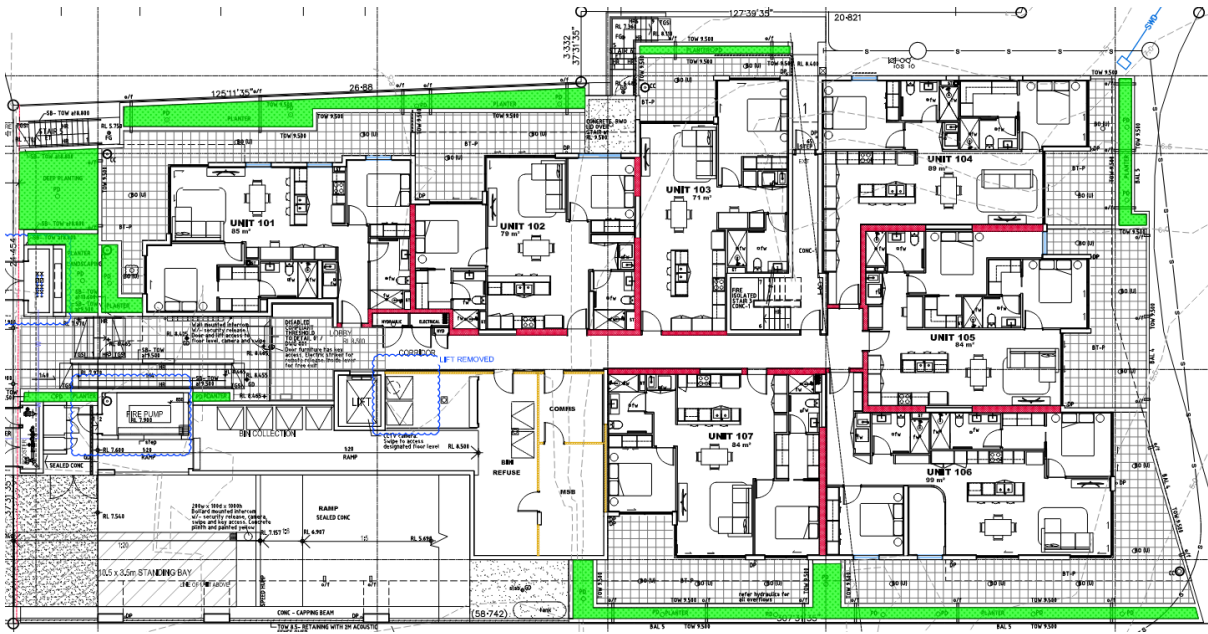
Proposed amended ground floor plan with landscaping areas highlighted in green demonstrating consistency with approval
